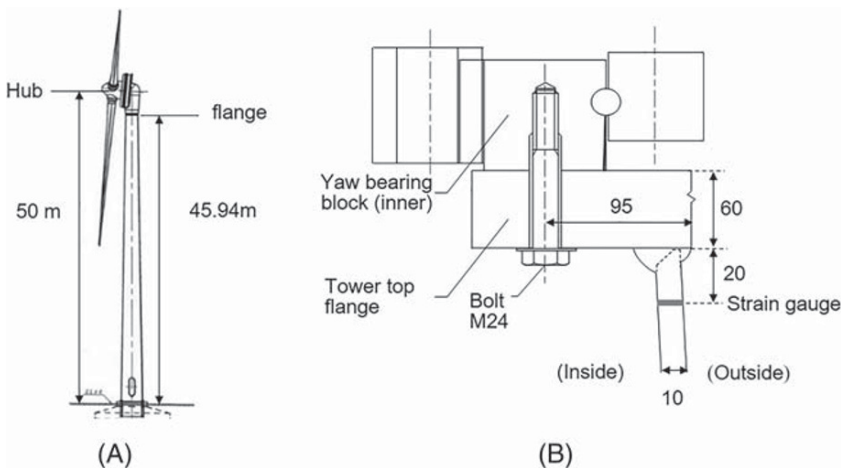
Overview of the tower-top flange: (A) the flange location and (B) cross section of the flange
